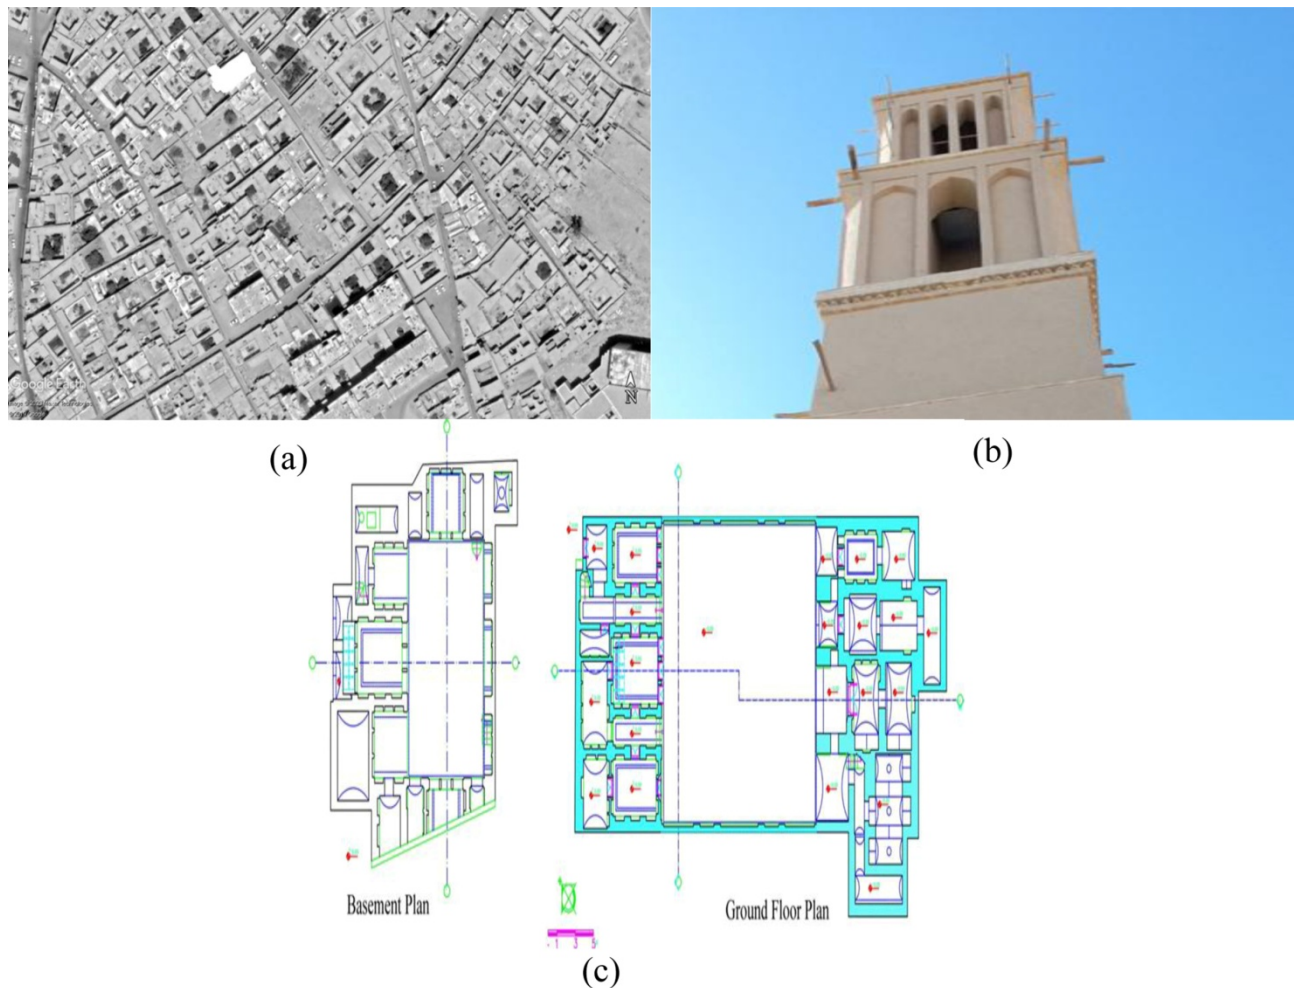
Case 3, (a) Aerial view (b) Building façade and (c) Plan
